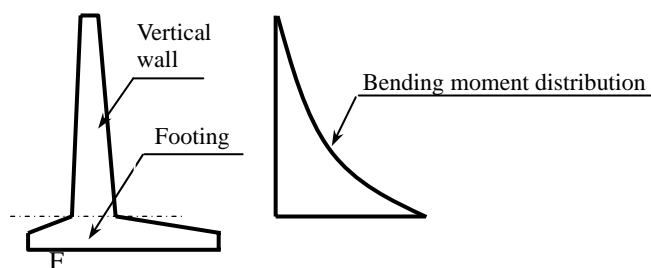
Normal Cross Section Shape of a Reverse T-shaped Retaining Wall
